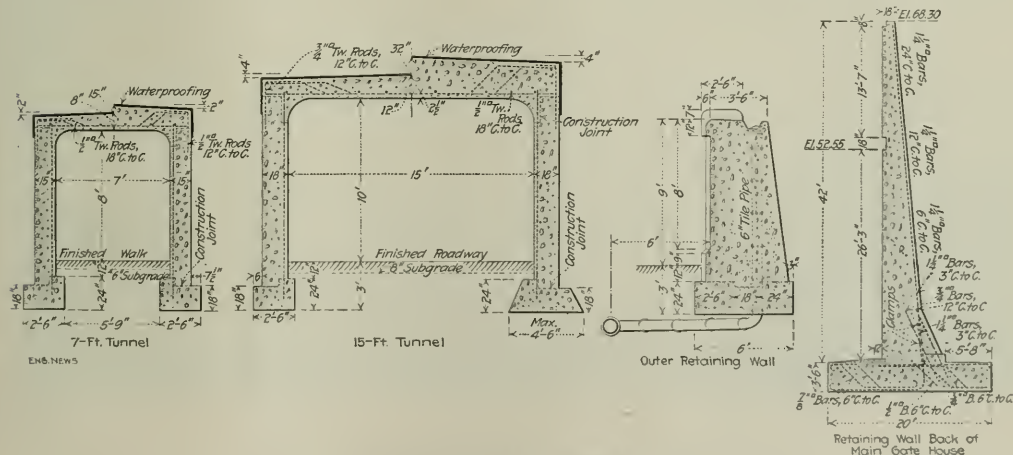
RETAINING-WALLS AND TUNNELS OF YALE BOWL
